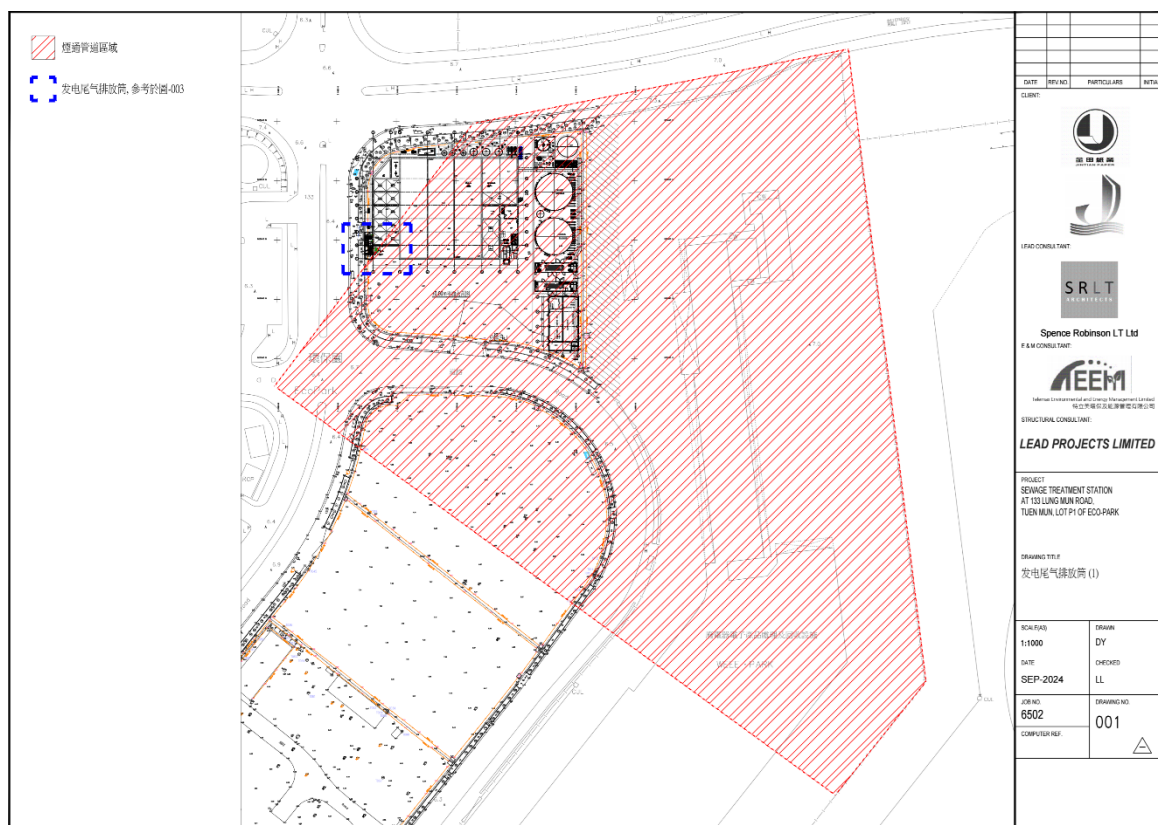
Keyplan for Fume Exhaust Pipe, Biogas Gensets & Chimney Restricted Area of EcoPark
